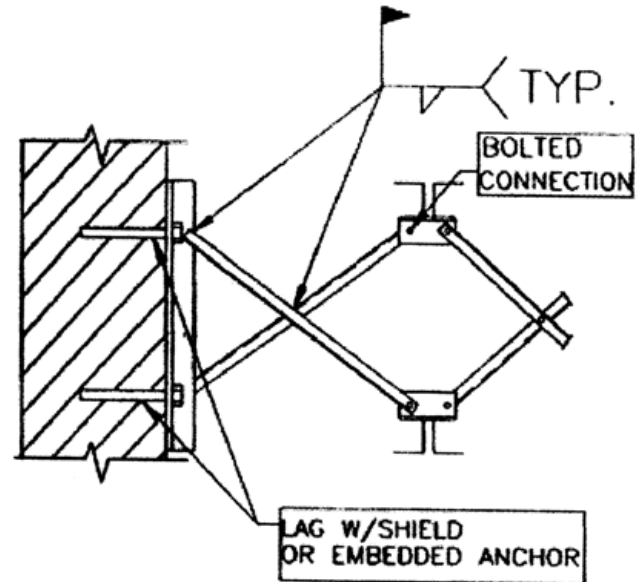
Anchorage of row of bridging to masonry wall. From non-mandatory OSHA guidelines (29 CFR 1926 Subpart R, Appendix C).
